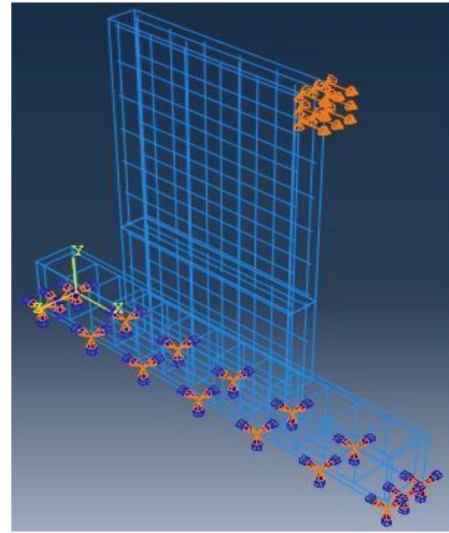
Precast wall panel—intermediate 1 (reinforcement detailing).
